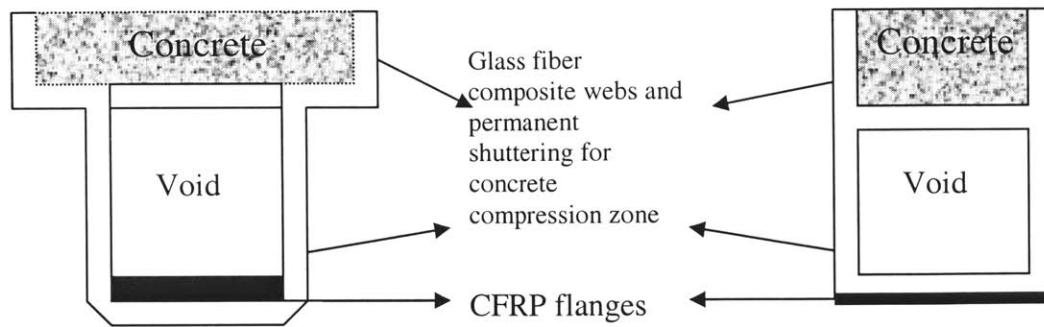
FRP composite and Concrete Hybrid Beam
